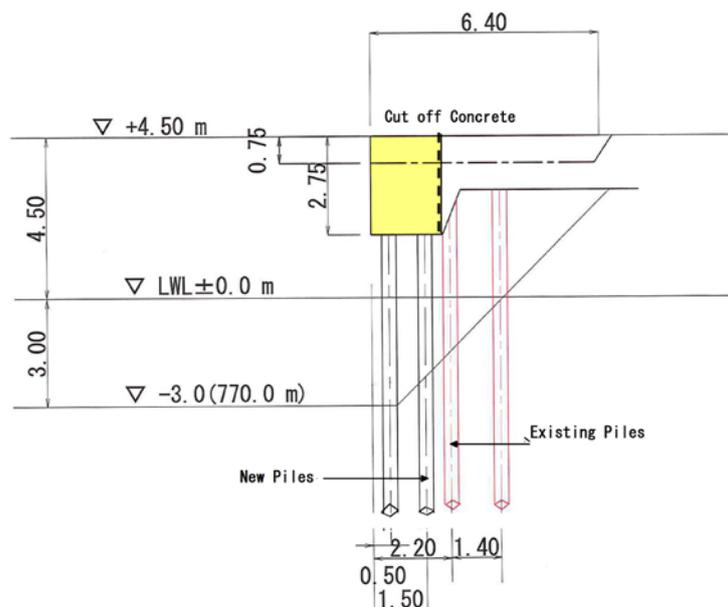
Typical Cross Section of the Extension for the Gantry Crane Berth
